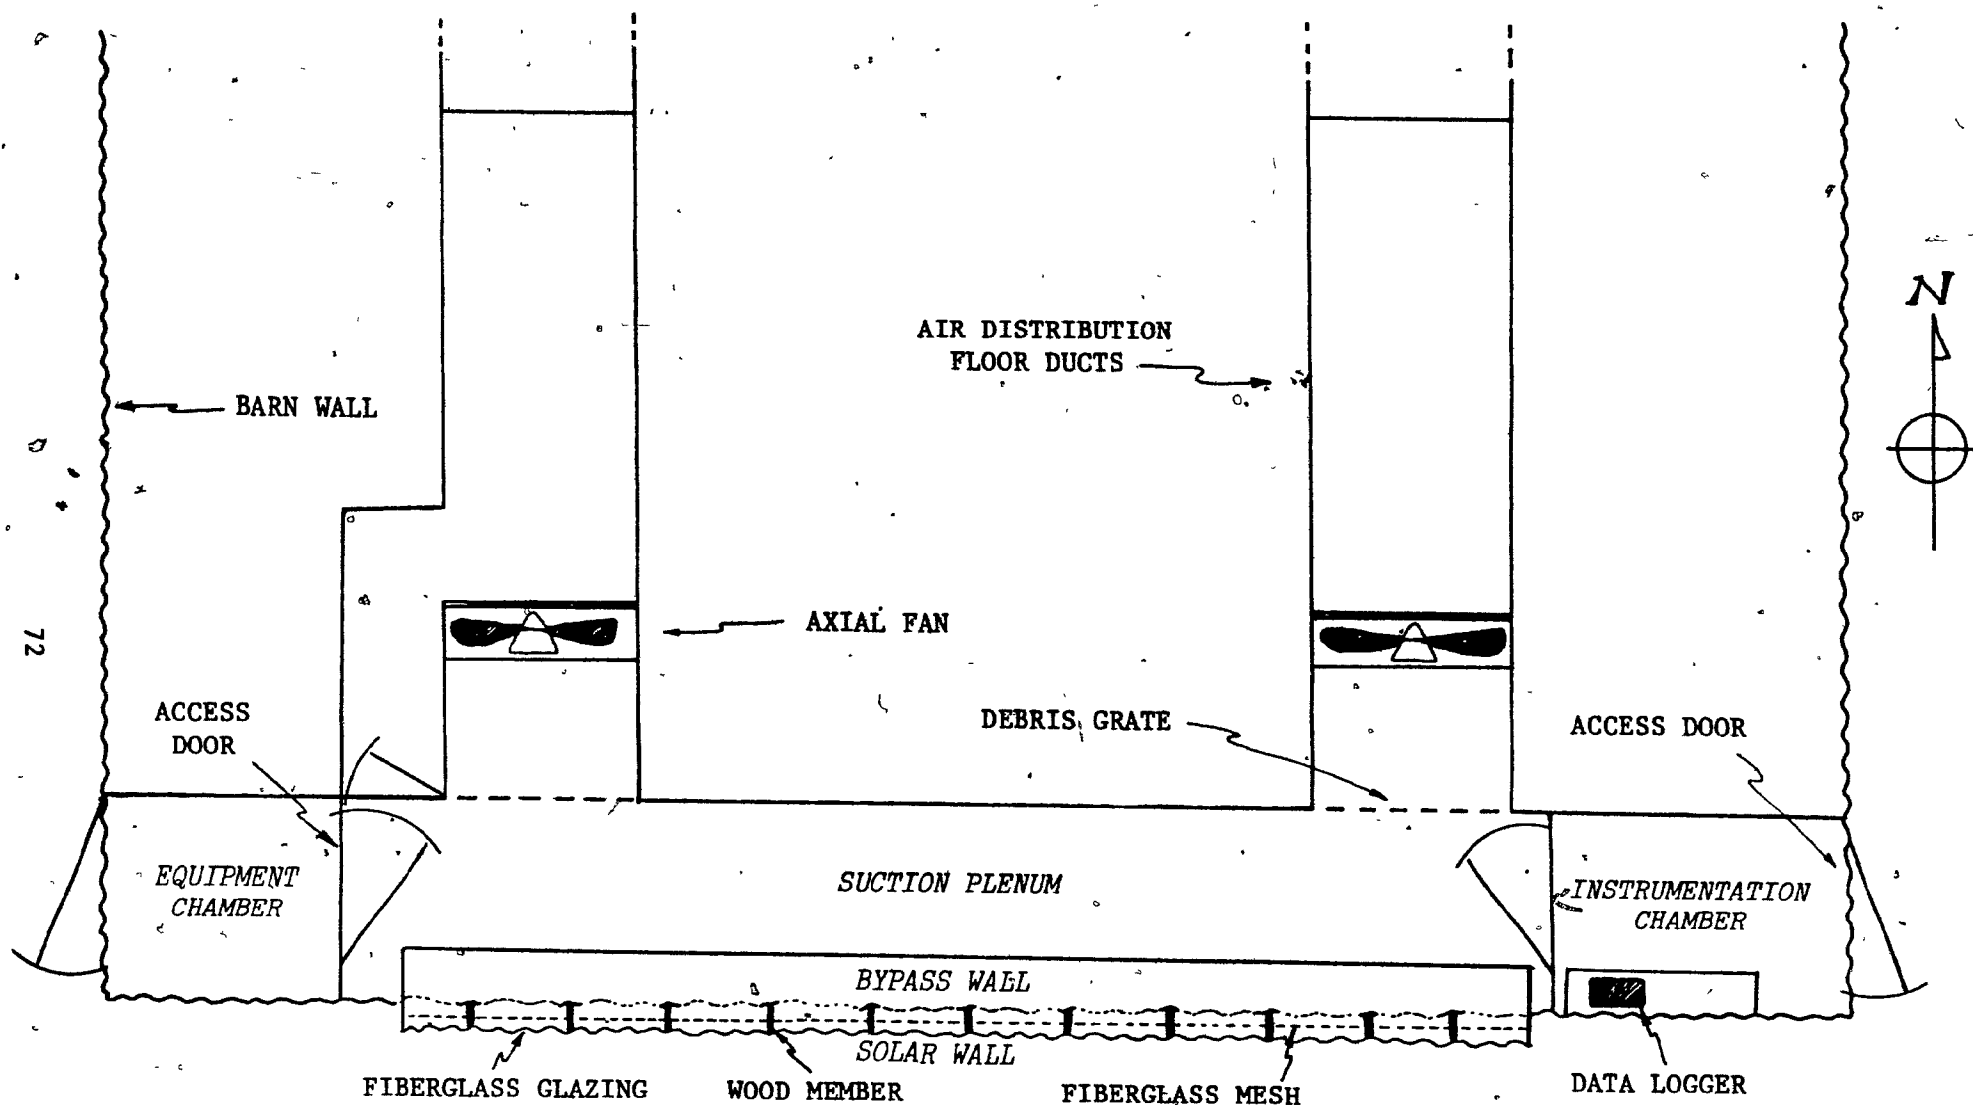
Floor plan of south section of Barn Solar Hay Dryer (not to scale).
